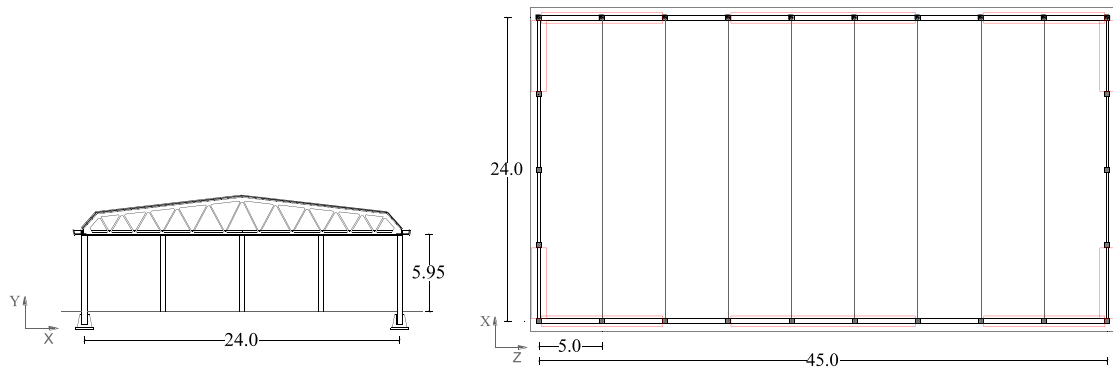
Building EE3 – frontal view and plan view with infill walls arrangement. (Units: m).
